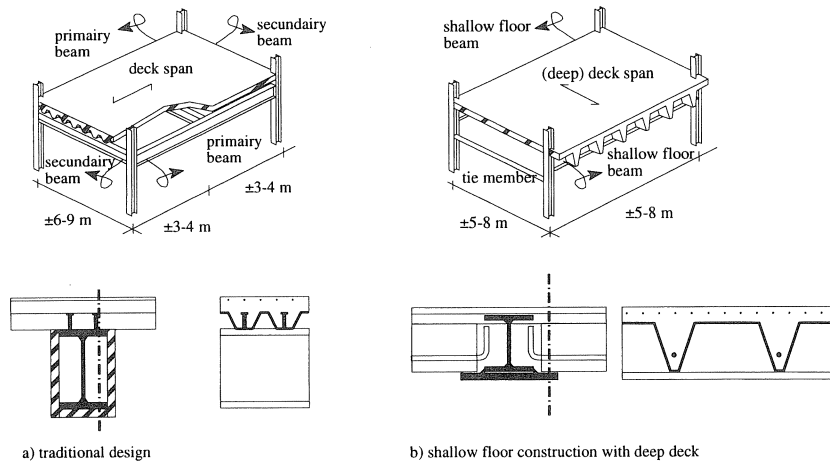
Steel framed buildings: traditional and shallow floor construction: inherent better fire behaviour steel beam reduction of total construction height.
